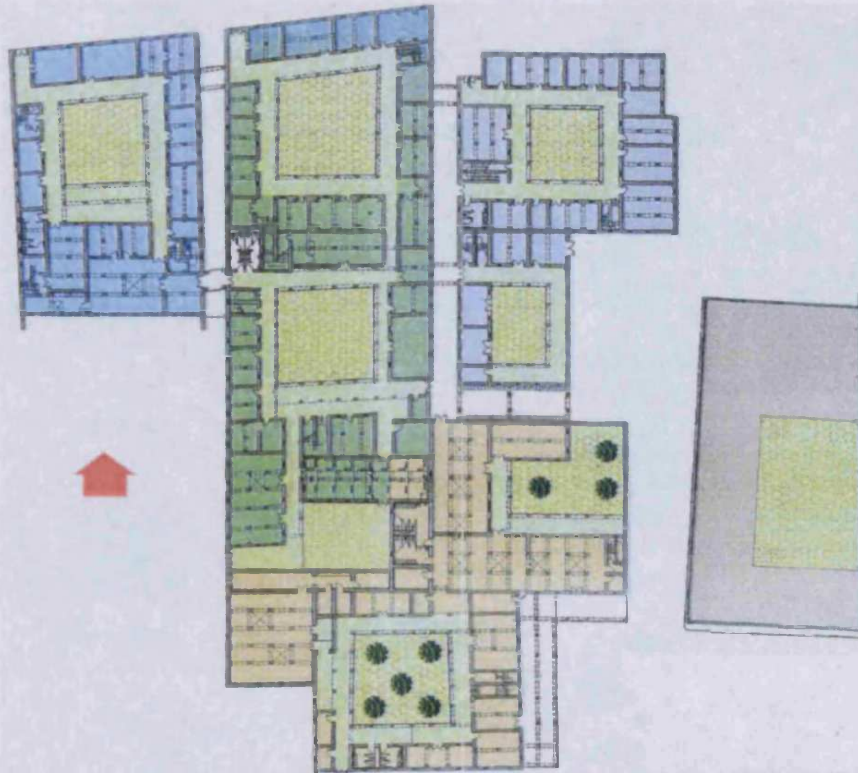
Ground floor of the mud buildings. Source: ADR modified by the author ⁽⁶⁻³⁾.
